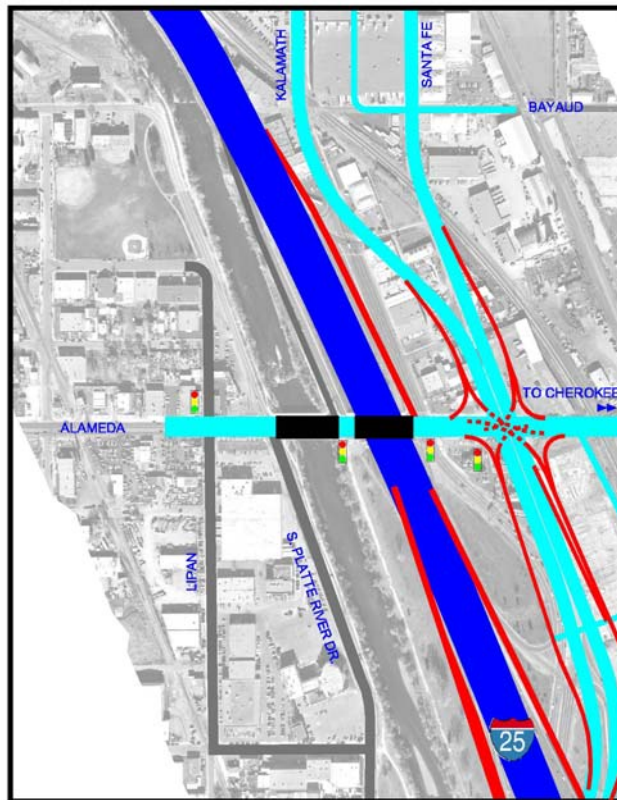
System Alternative 2, Alameda Avenue Interchange
